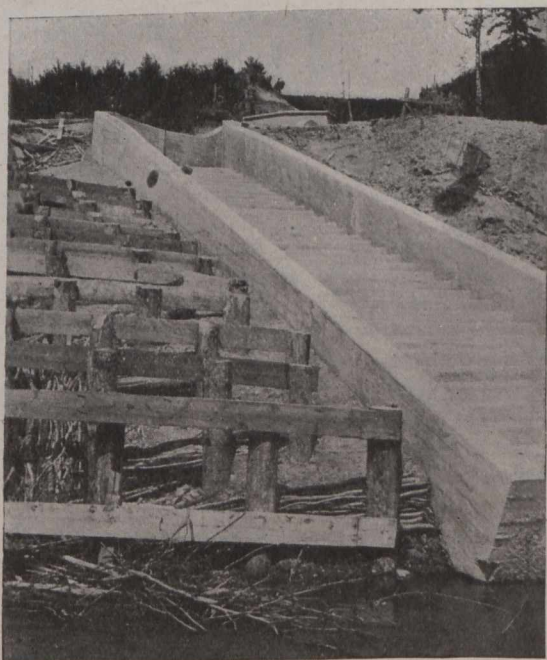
Tunnel Sewer Outfall with Storm Overflow.
